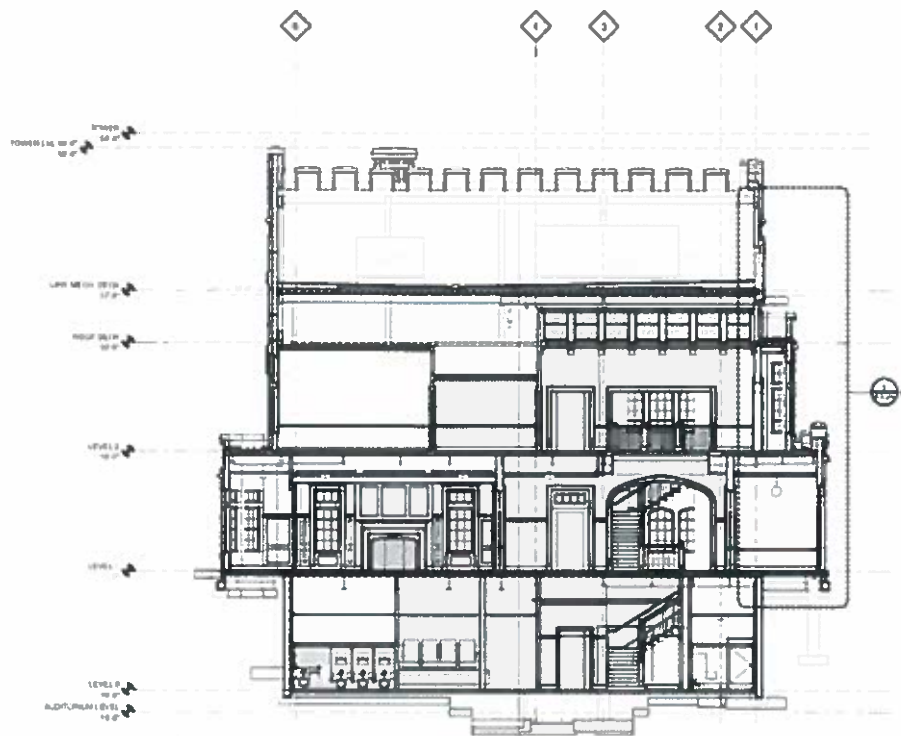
Elevation Profile of Dundon Berchtold Hall
